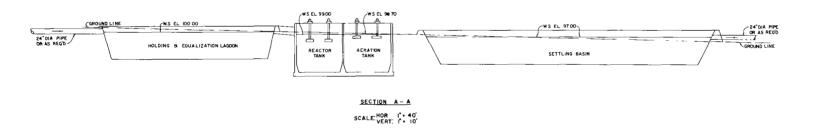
Plant Layout and Hydraulic Profile for 4.0 mgd Limestone
